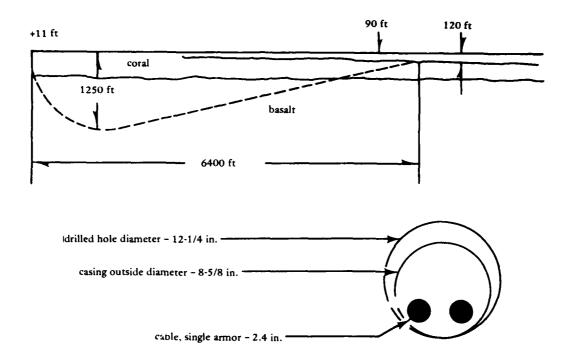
Oil rig drill-hole profile for 6,400-ft traverse in coral. Cross section shows drill-hole, casing, and cable relationship (Valent and Brackett, 1976).
